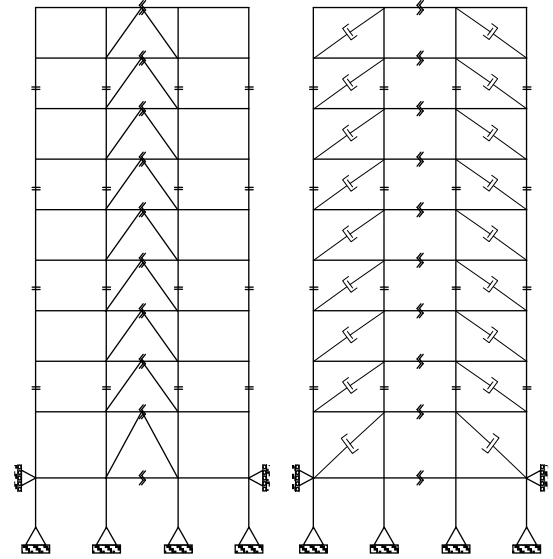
Configuration of steel bracing (left) and damper (right) in 9-storey building
